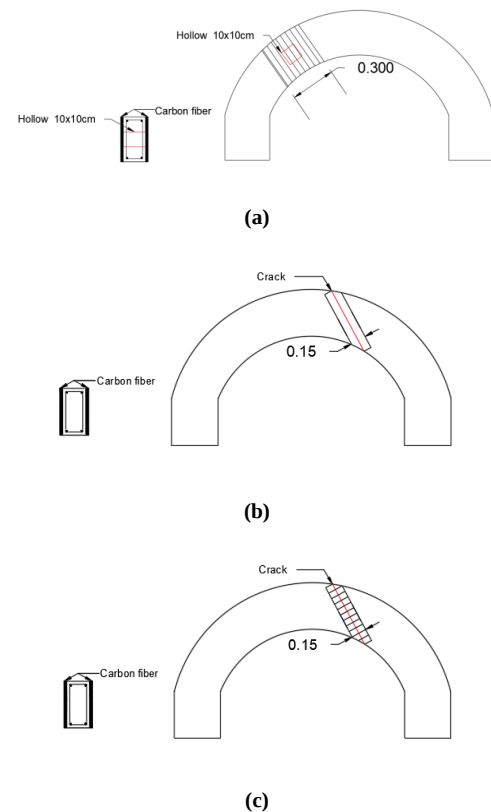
The location and dimensions of the carbon fibers (the dimensions of the drawing are in meters): (a) The specimen (Hc1). (b) The specimen (Ic1). (c) The specimen (Ic2)
